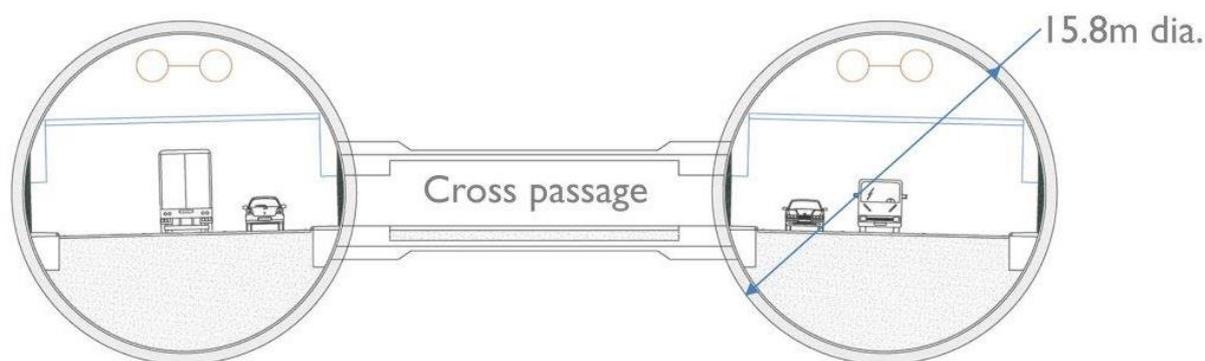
BORED TUNNEL CROSS SECTION AT LOCATION C
